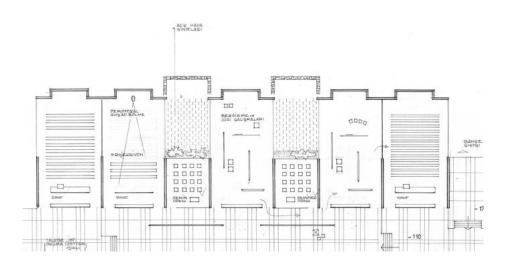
Classrooms on the west façade with flexible use, close-up of figure 25.
